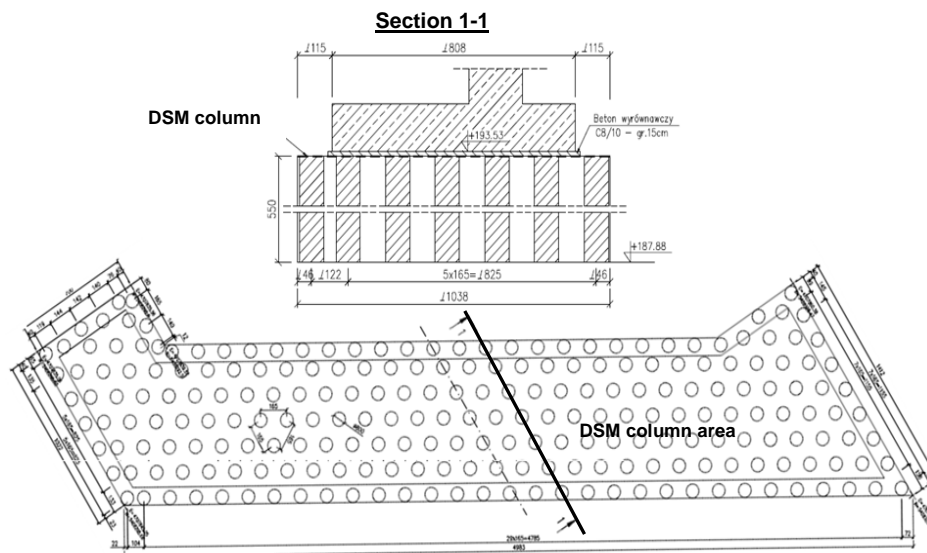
Strengthening subsoil with DSM columns under the abutment
